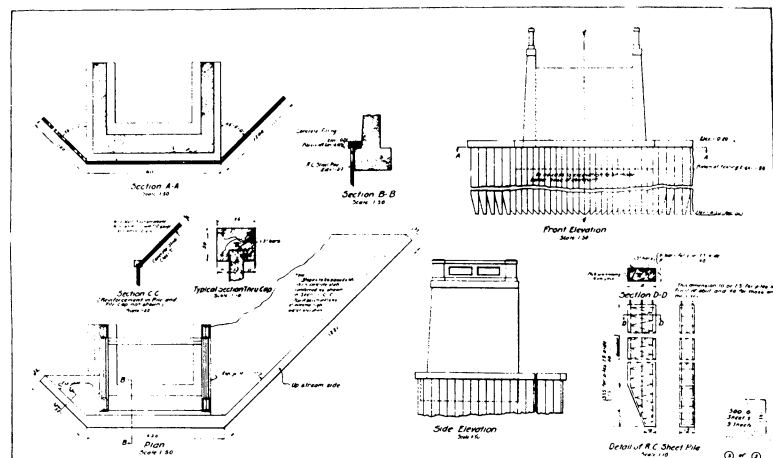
Protection of north (Laoag) abutments not damaged by floods.
